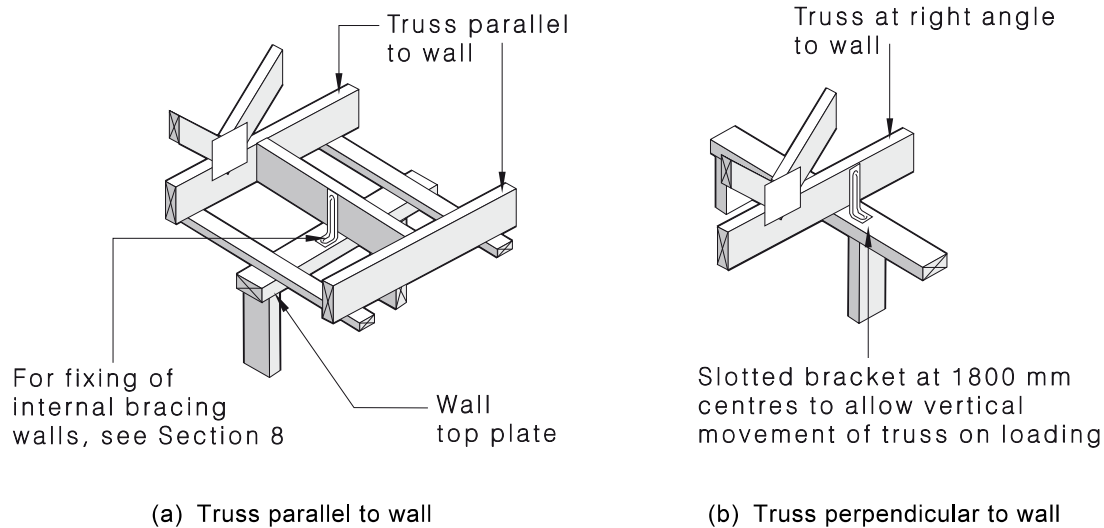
FIXING OF TRUSSES TO A NON-LOADBEARING INTERNAL WALL
